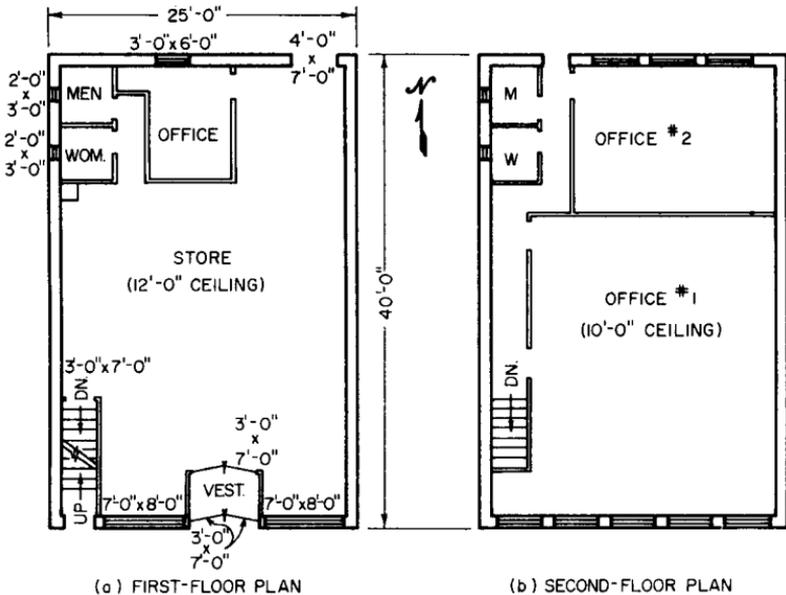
First-floor and second-floor plans of a two-story building.
